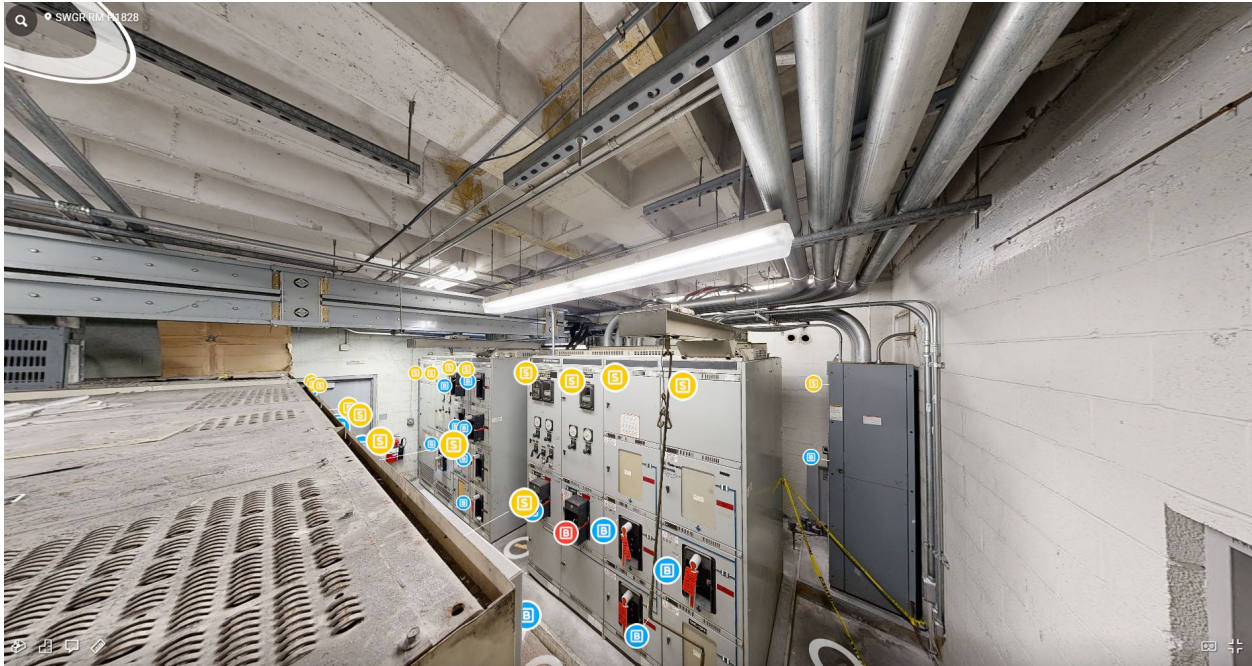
Matterport image of overhead room setup/condition taken from mechanical room doors, towards north side of room.
